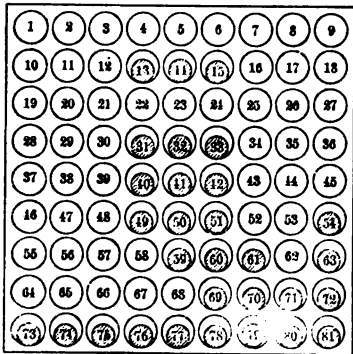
SECTION OF CONDUIT LINE, MANHOLES 3 TO 4.
